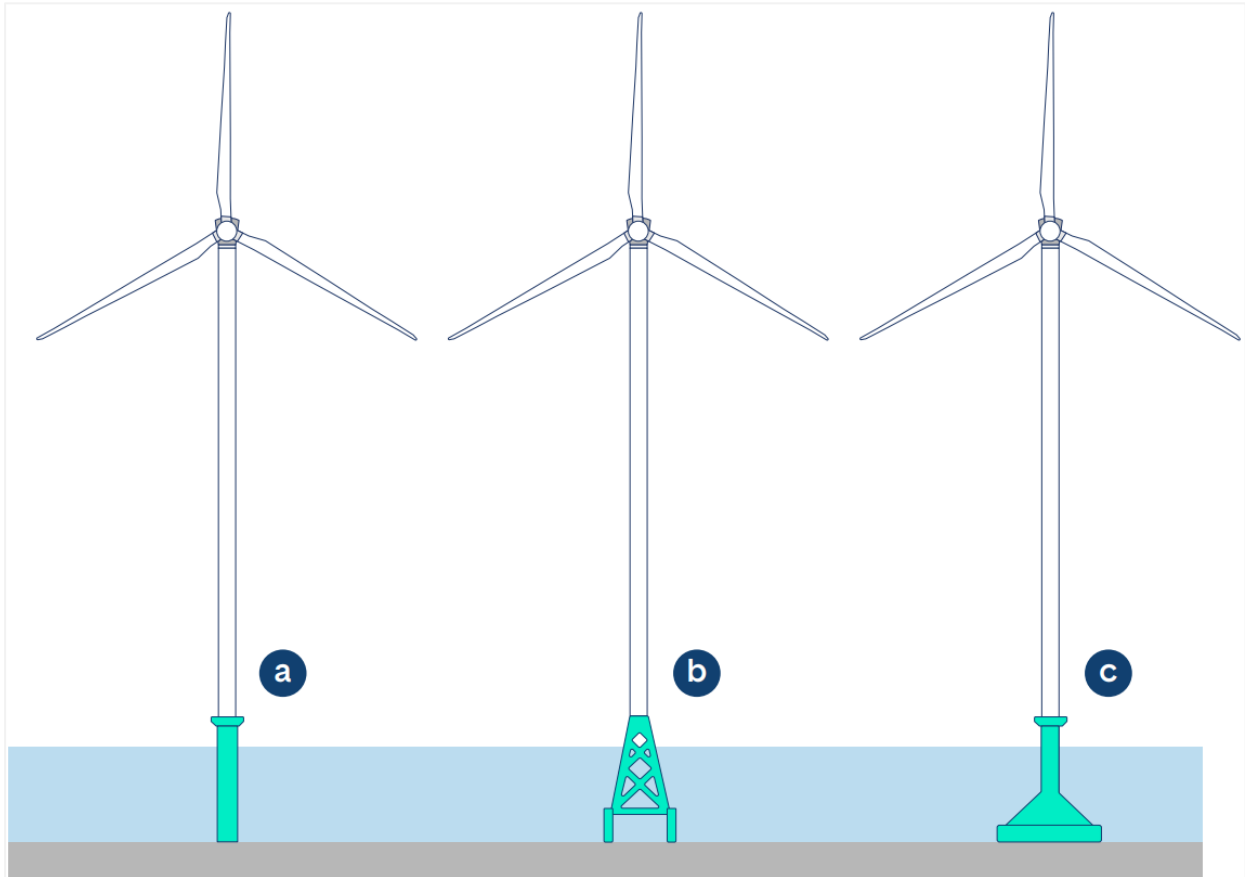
Types of foundations: a – monopile, b – jacket, c – gravity based.
